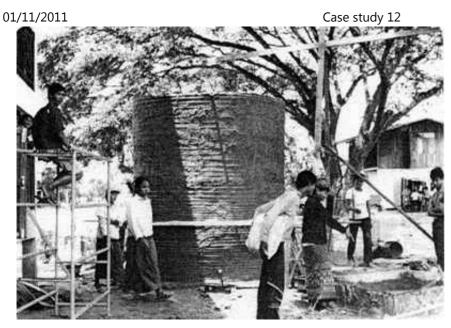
a partially finished brick tank showing external rendering and hoop reinforcement (Chayatit Vadhanavikkit)
